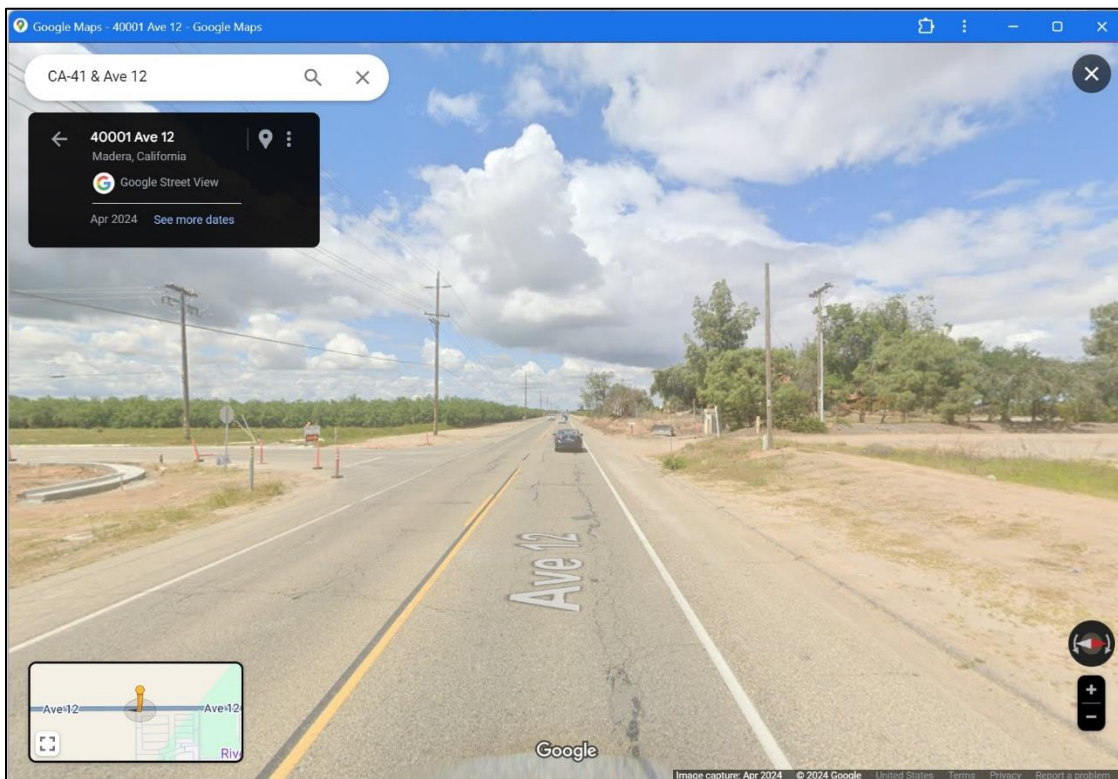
Ave. 12 at Riverwalk Blvd., Facing West
